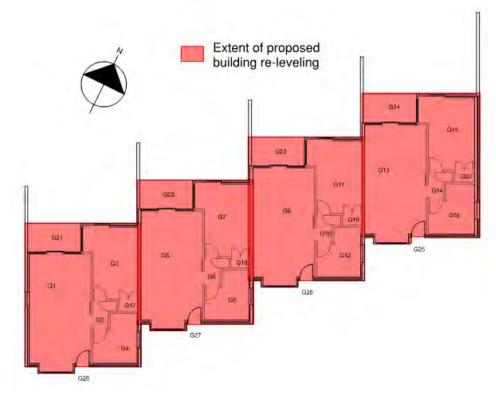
Foundation Plan - Re-Levelling Repairs
